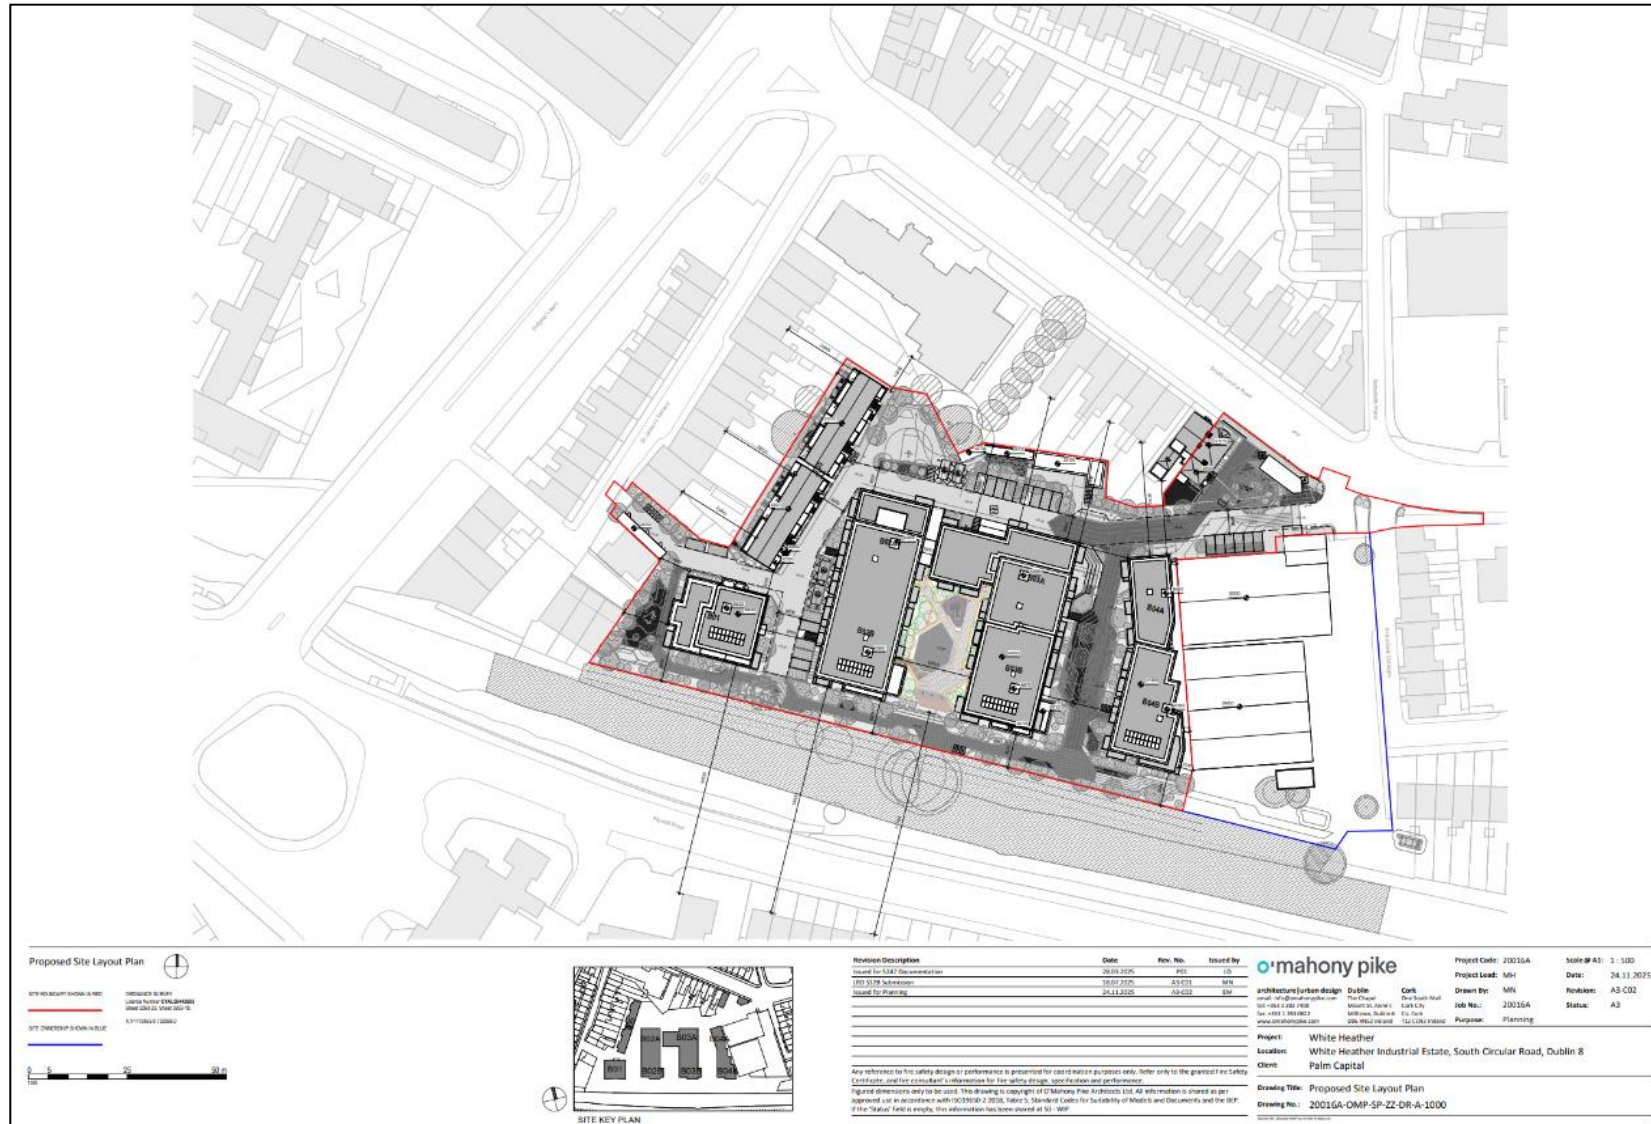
Proposed Development Site Layout (O'Mahony Pike, 2025).
